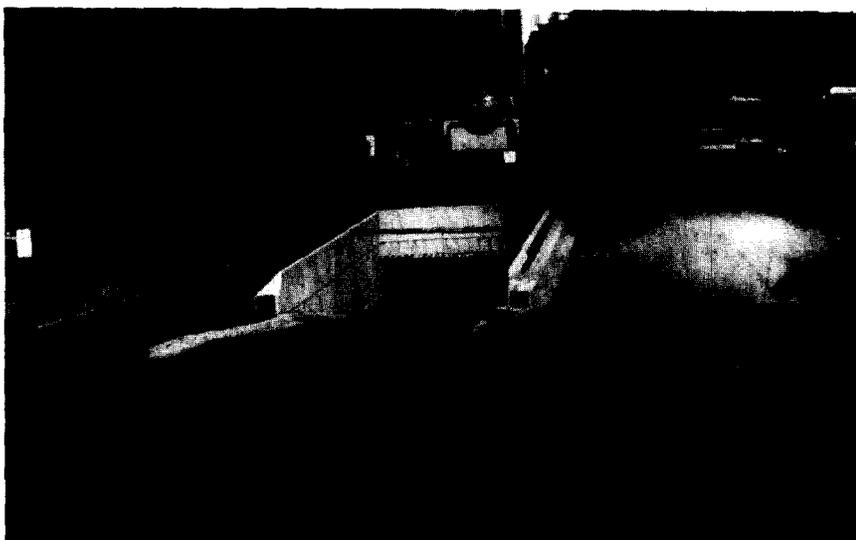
Entrance to the Sydney Opera House Underground Car Park (photo: R. Sterling).
